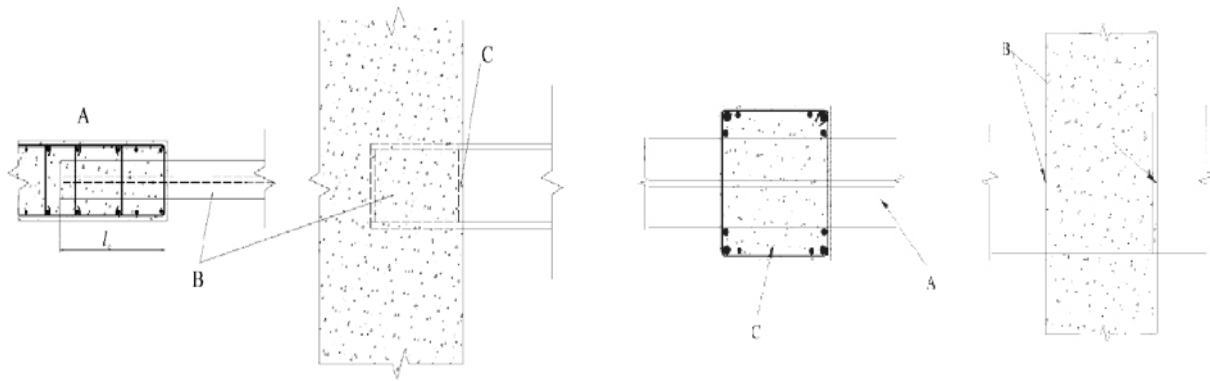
Coupling beam framing into a wall (on the left) and beam-to-column connection (on the right)
